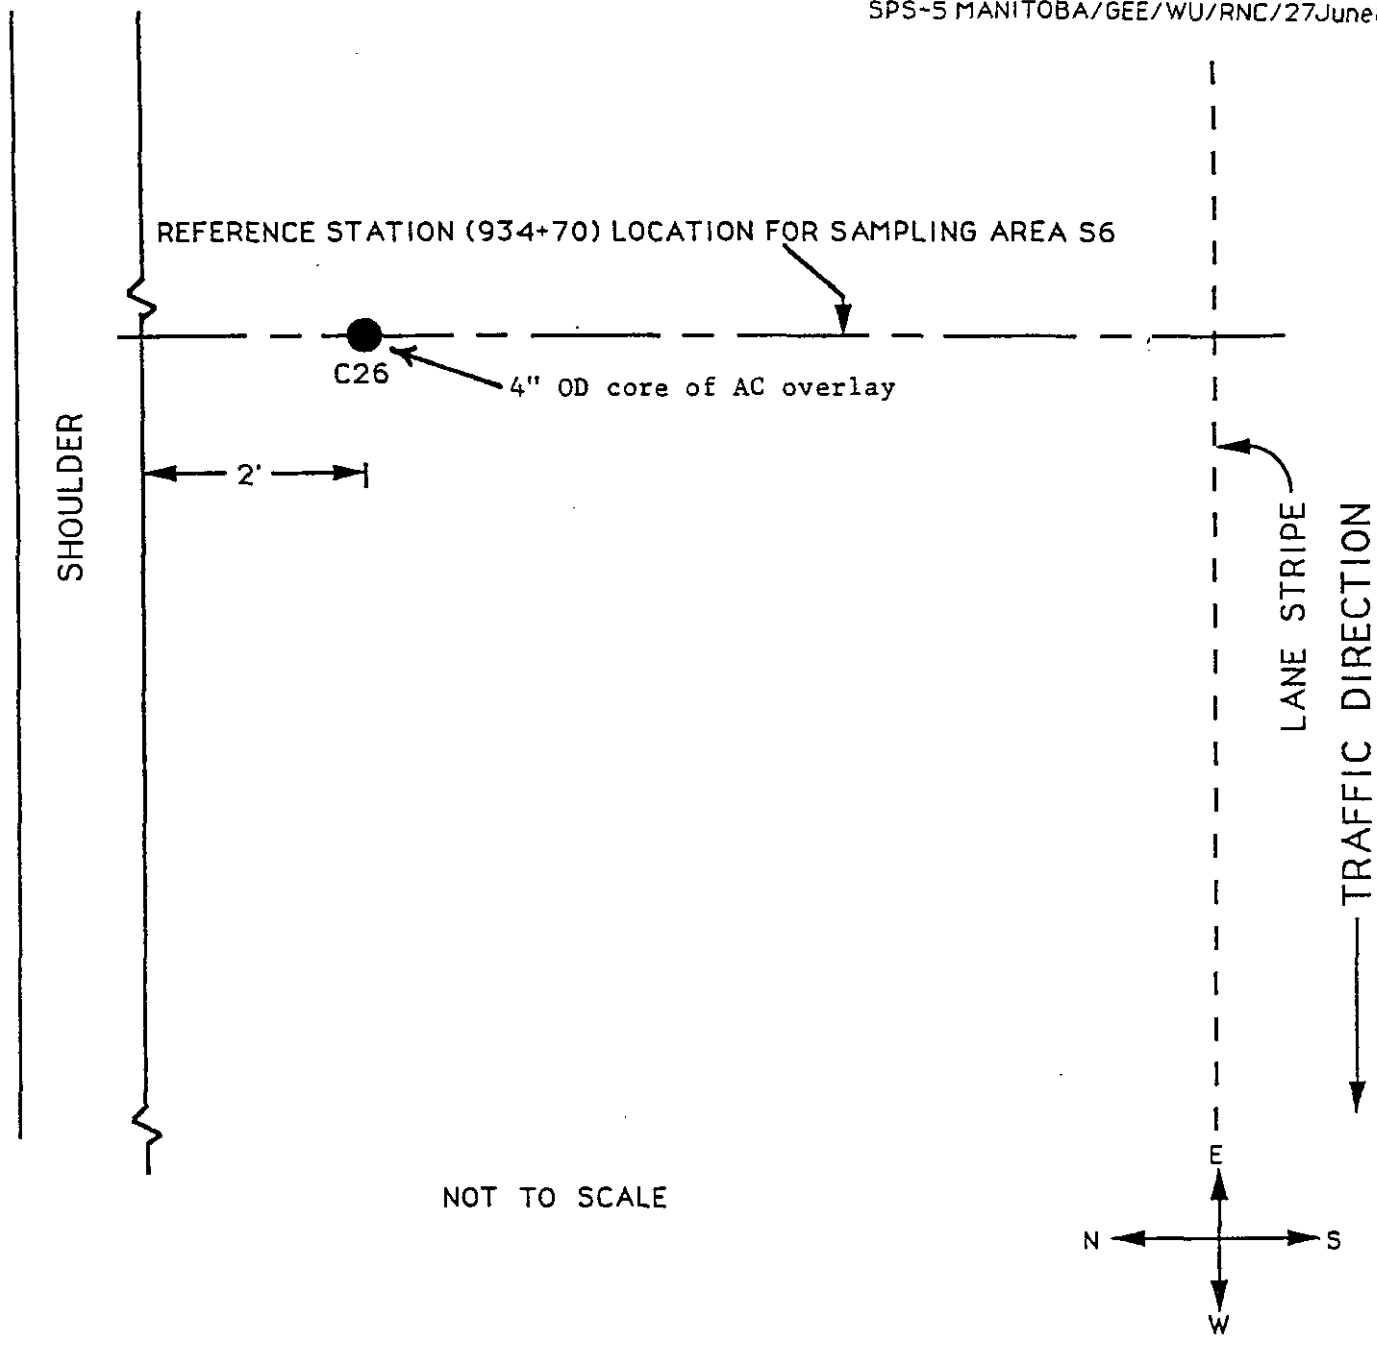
After overlay sampling plan for station 934+70 before section 6. Sampling area S6.
